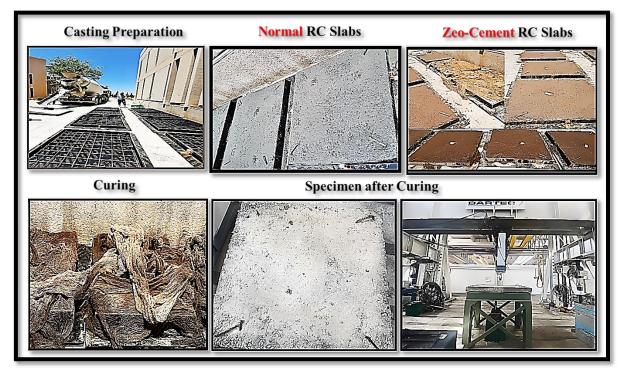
Continuously reinforced zeolite concrete pavement slabs
